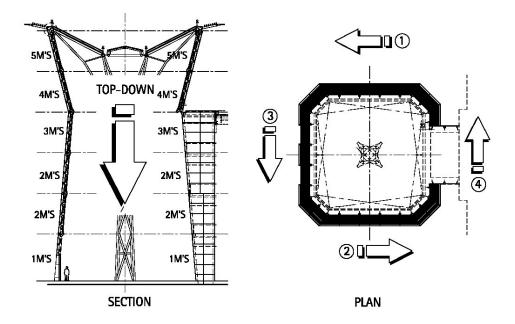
(a): Installation Sequence of Steel Mullion Plates
